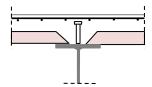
Cross-section of a secondary beam (with the sheeting in pink)
